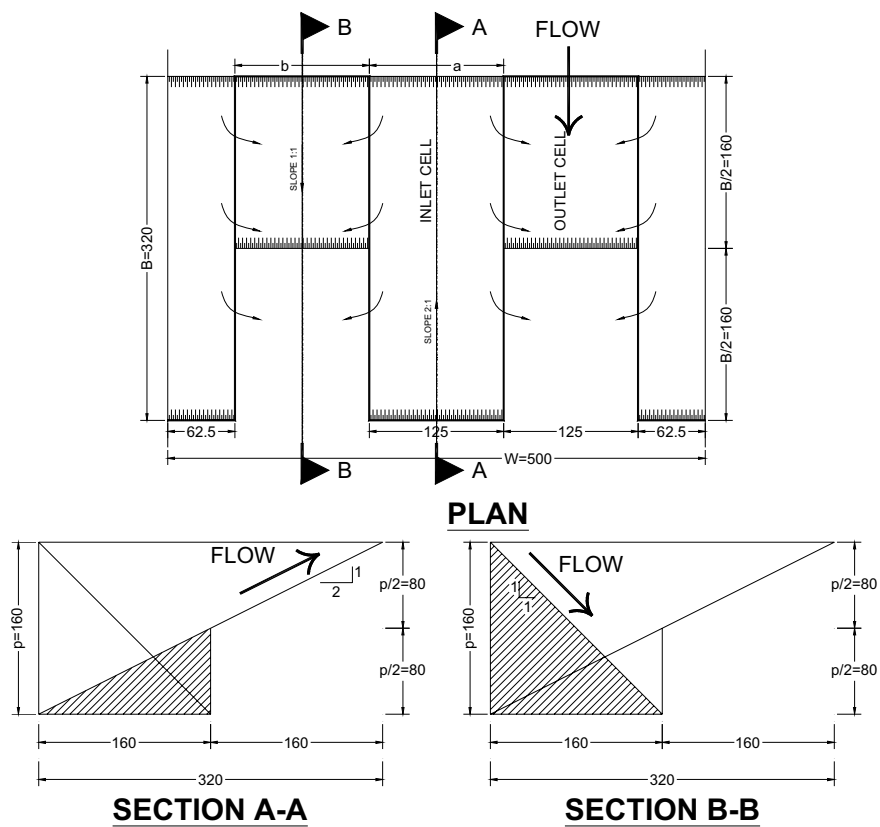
Plan and section of model P₄M₂ (both sides ramping), (dimensions in mm)
